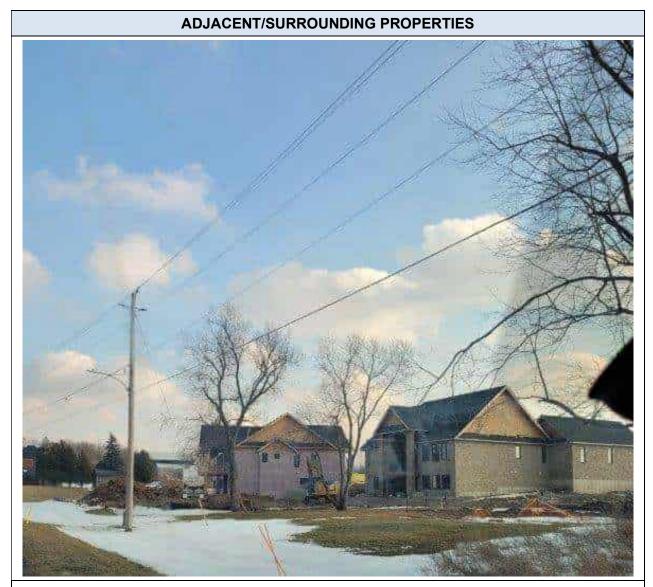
Looking east across study site. Picture taken from Highway 36 [Badenoch Street] at crest of hilltop.
